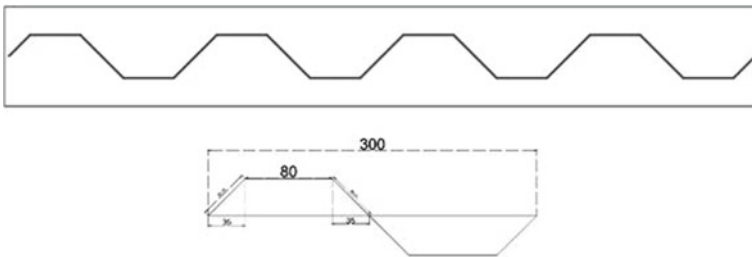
Cross section of beam with trapezoidal corrugated web and dimensions of each corrugation
